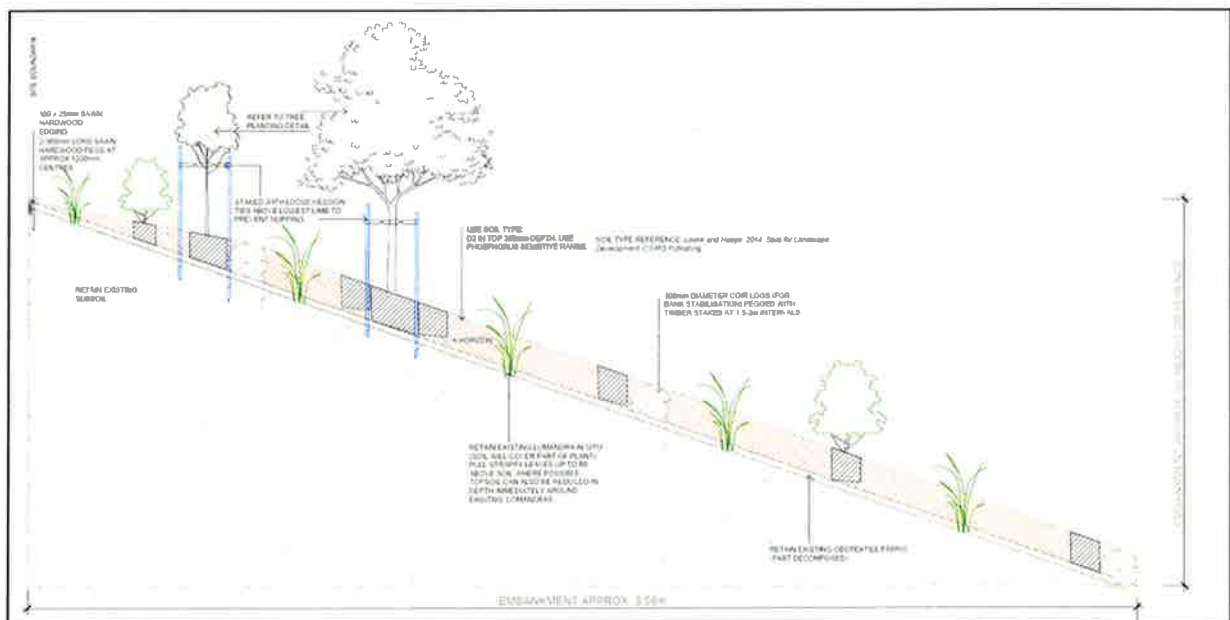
| Proposed cross section of plantings on Moona Creek Road frontage showing specific plantings
